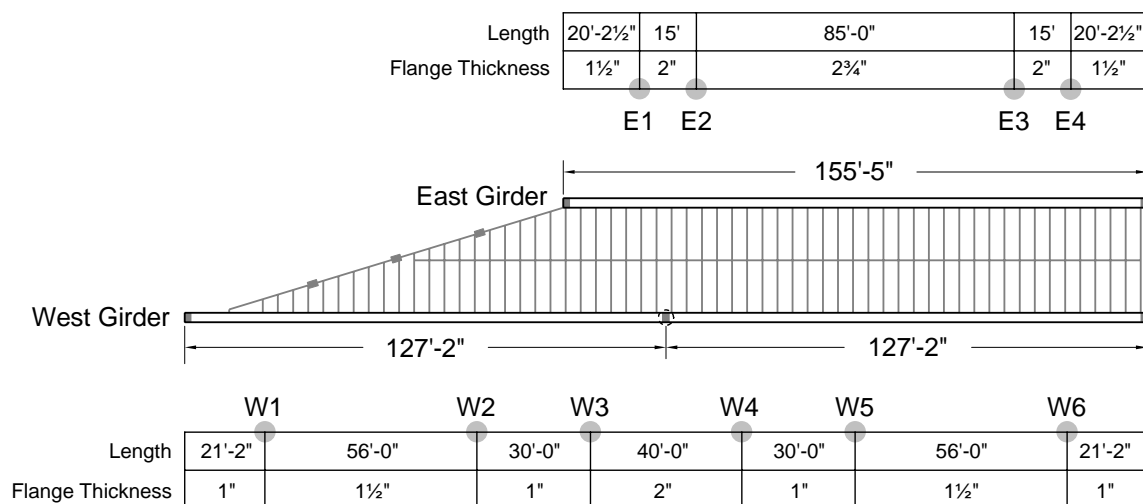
Proposed Instrument Locations for 12th Street Exit Ramp
